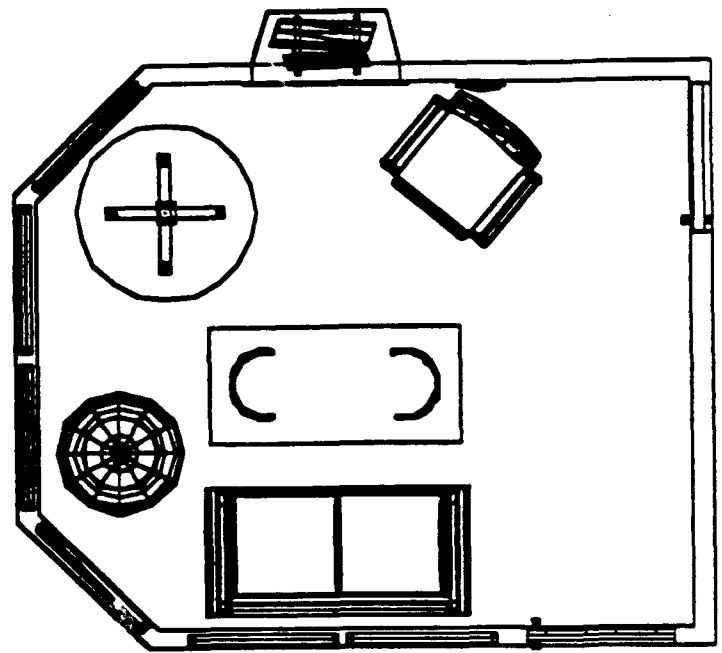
Floor plan of the living room of a hypothetical apartment model.
